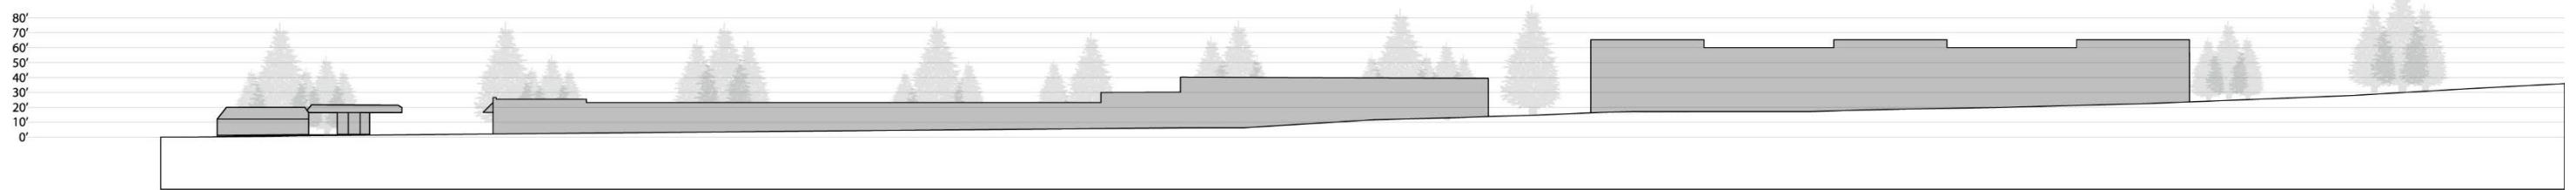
Elevation Views for Alternative 1—No Action
